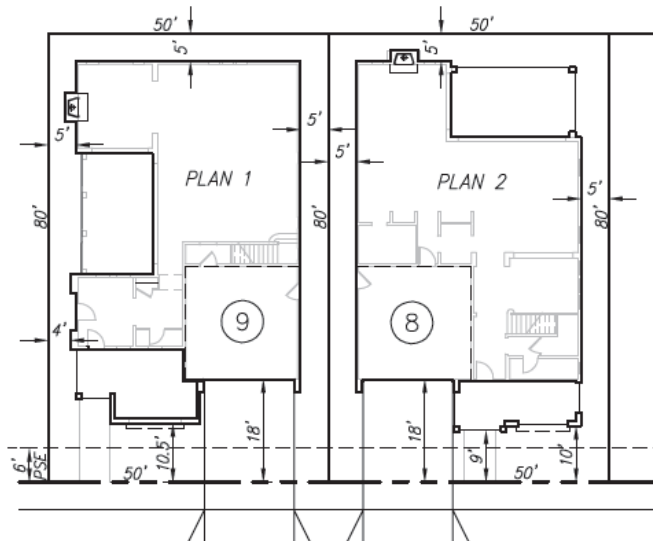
Typical Lot Plan for the Three-Story Single-Family Homes.
